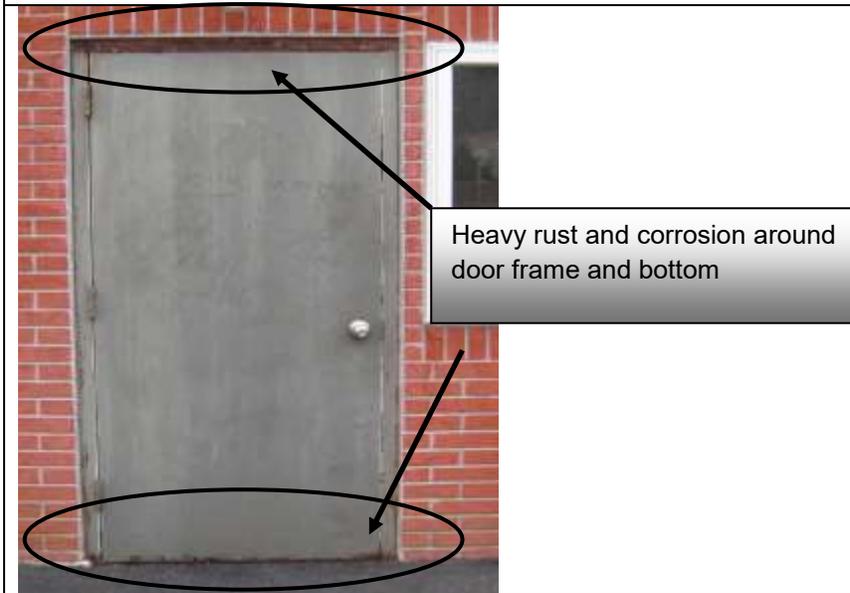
Water drains toward metal door. Heavy rust and corrosion around door bottom and door frame.
